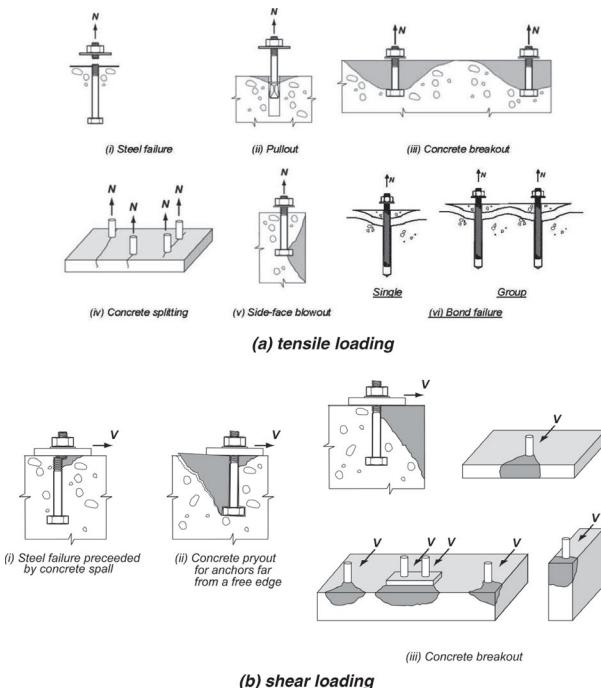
Failure Modes Considered in ACI 318-14, Chapter 17 (Courtesy of ACI)
